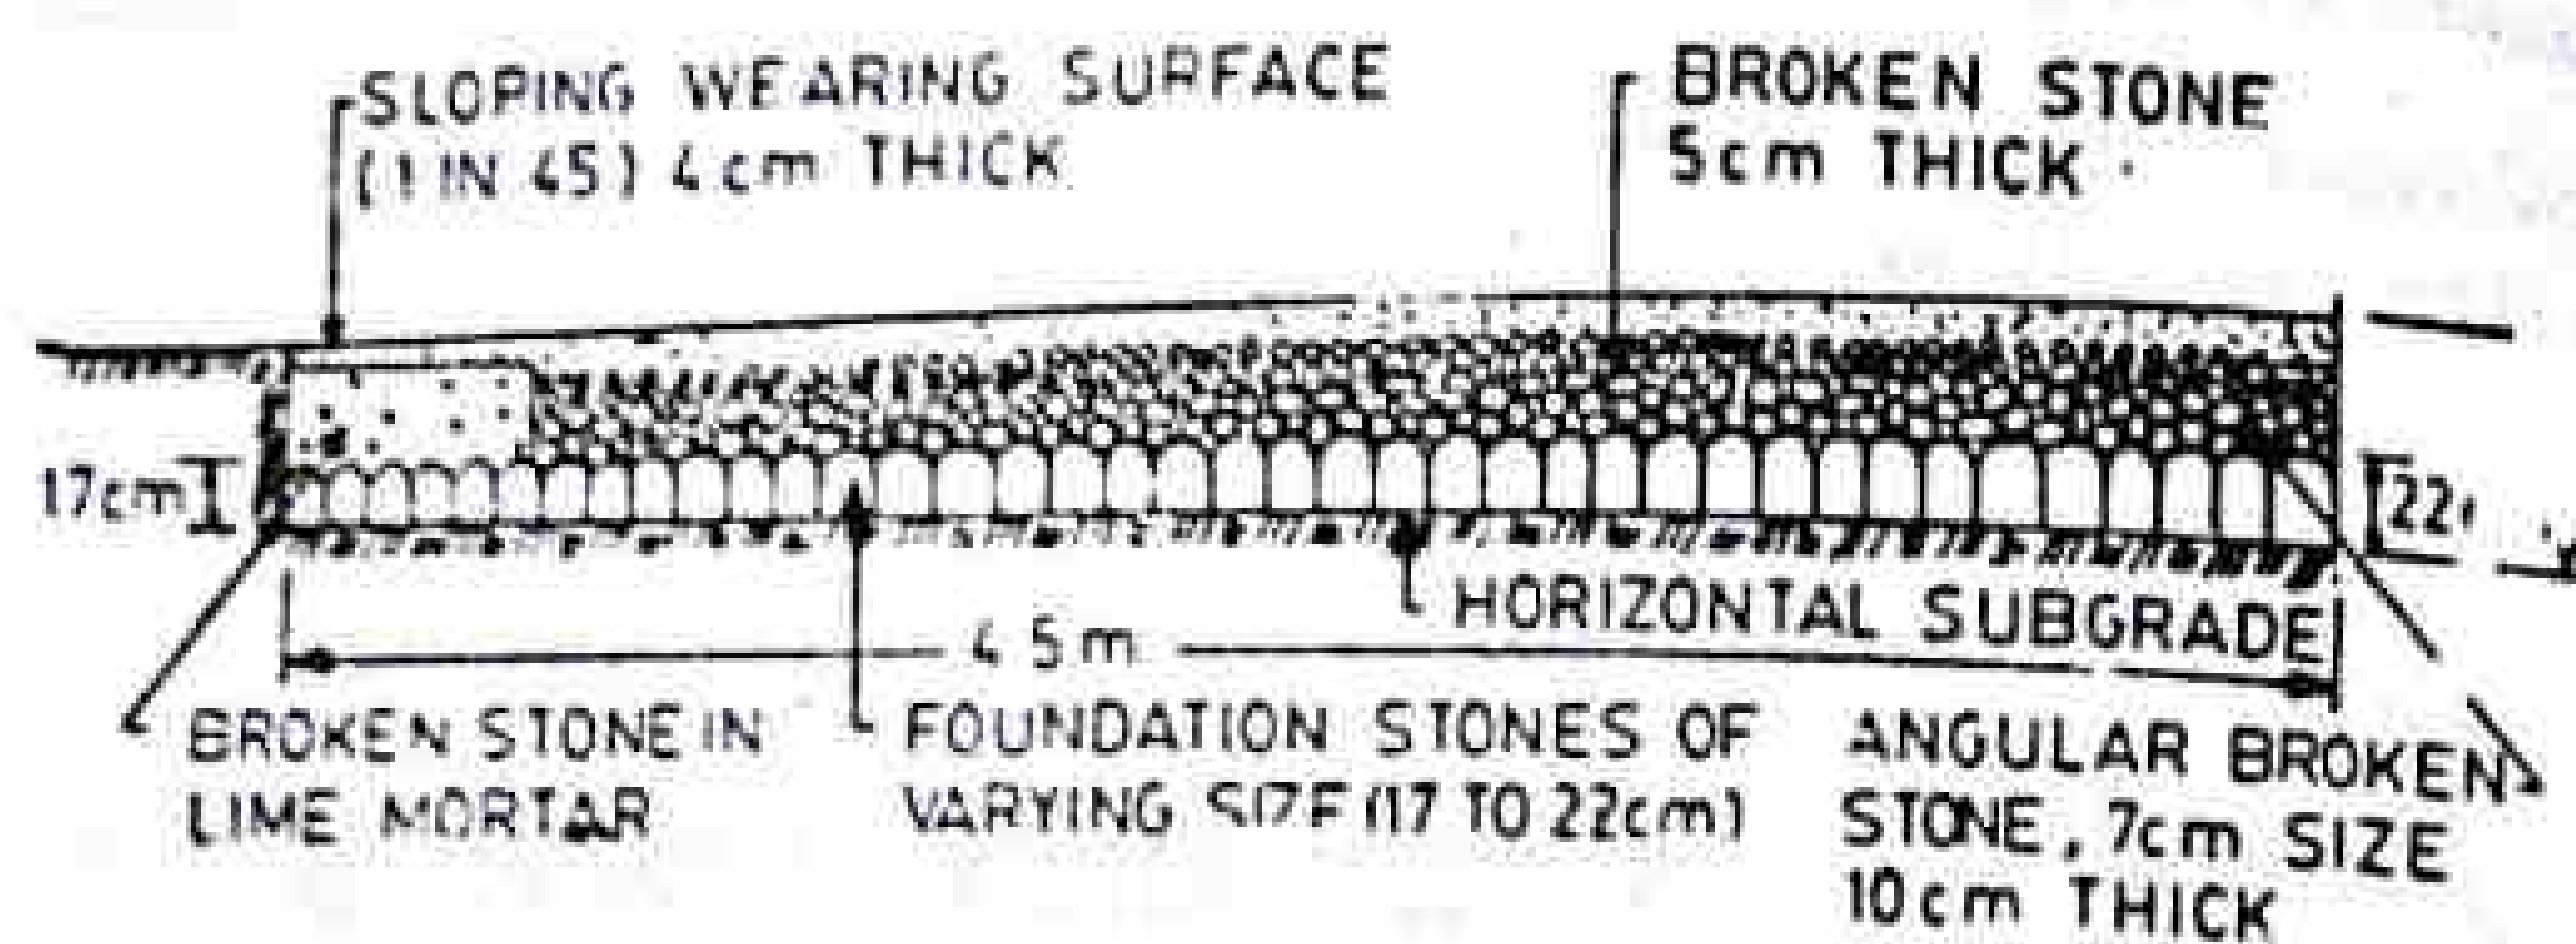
Typical Cross Section of Telford's Construction (1803 A.D.)
